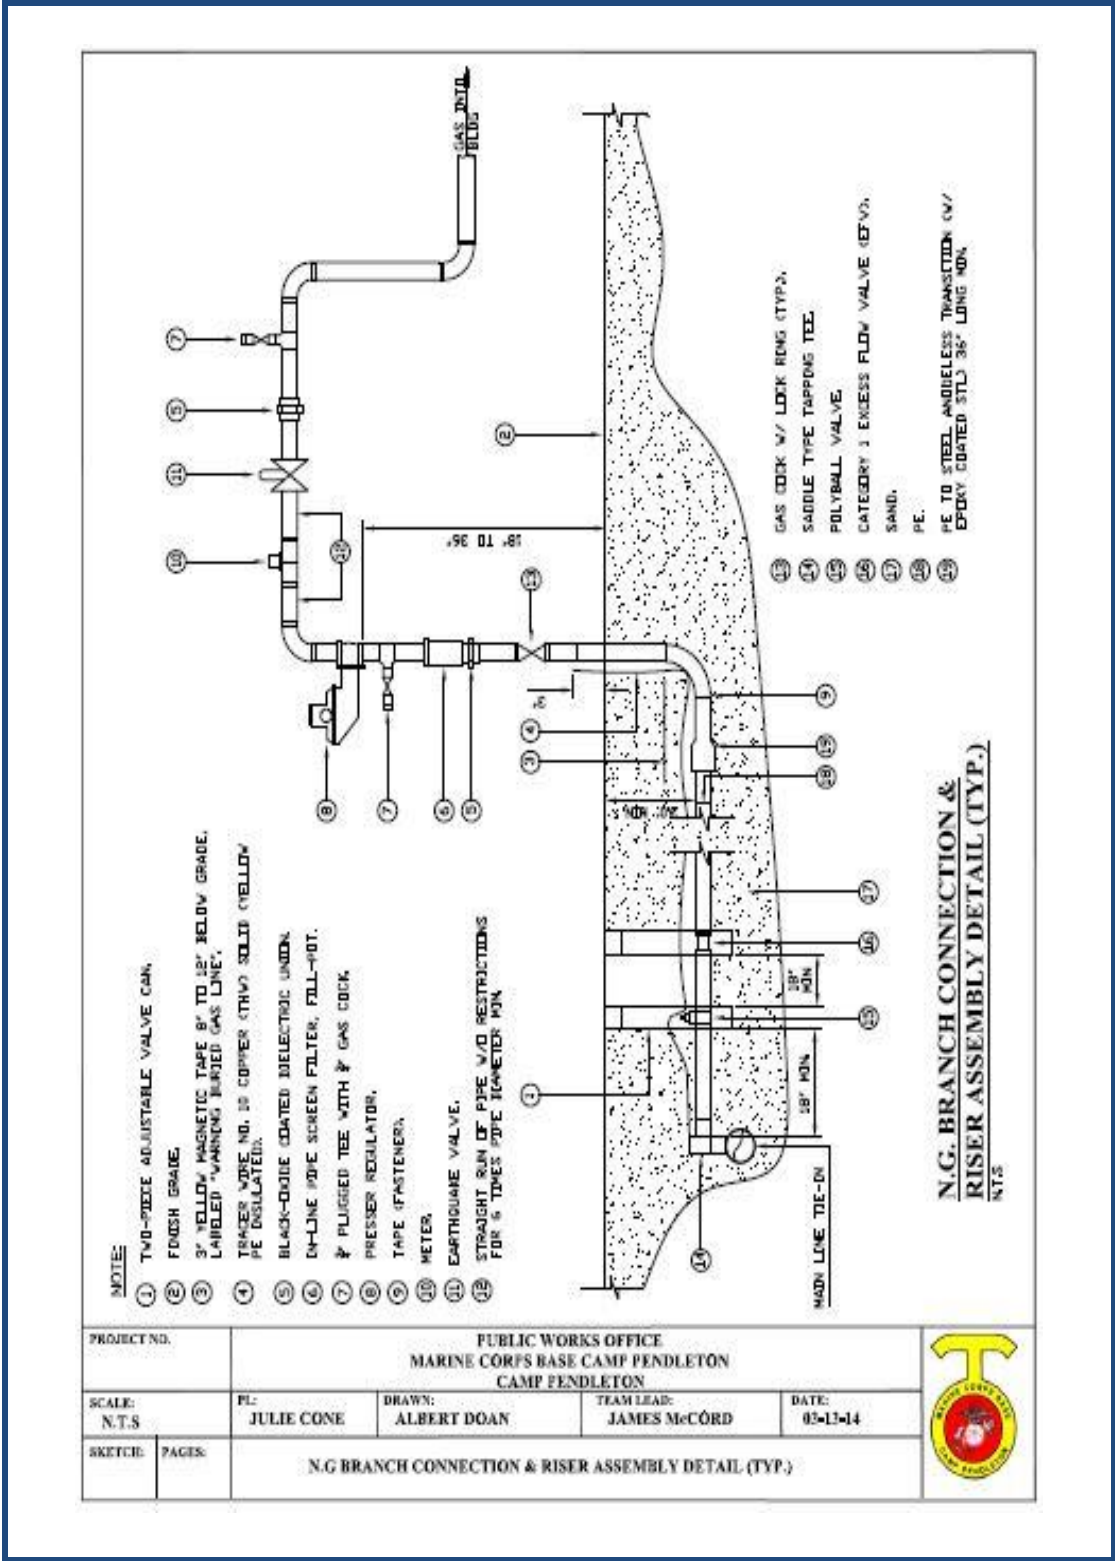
Natural Gas Connection and Riser Assembly Detail (TYP.)
